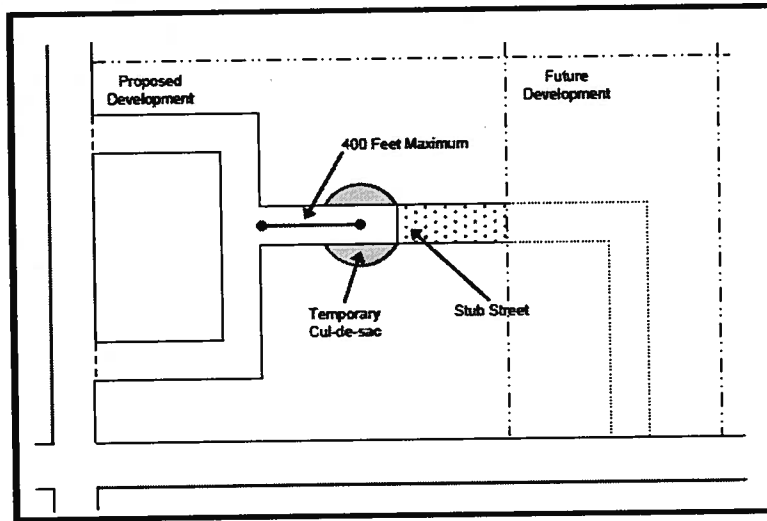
Cul-de-sac with Stub Street Extension to Future Development Example #2
